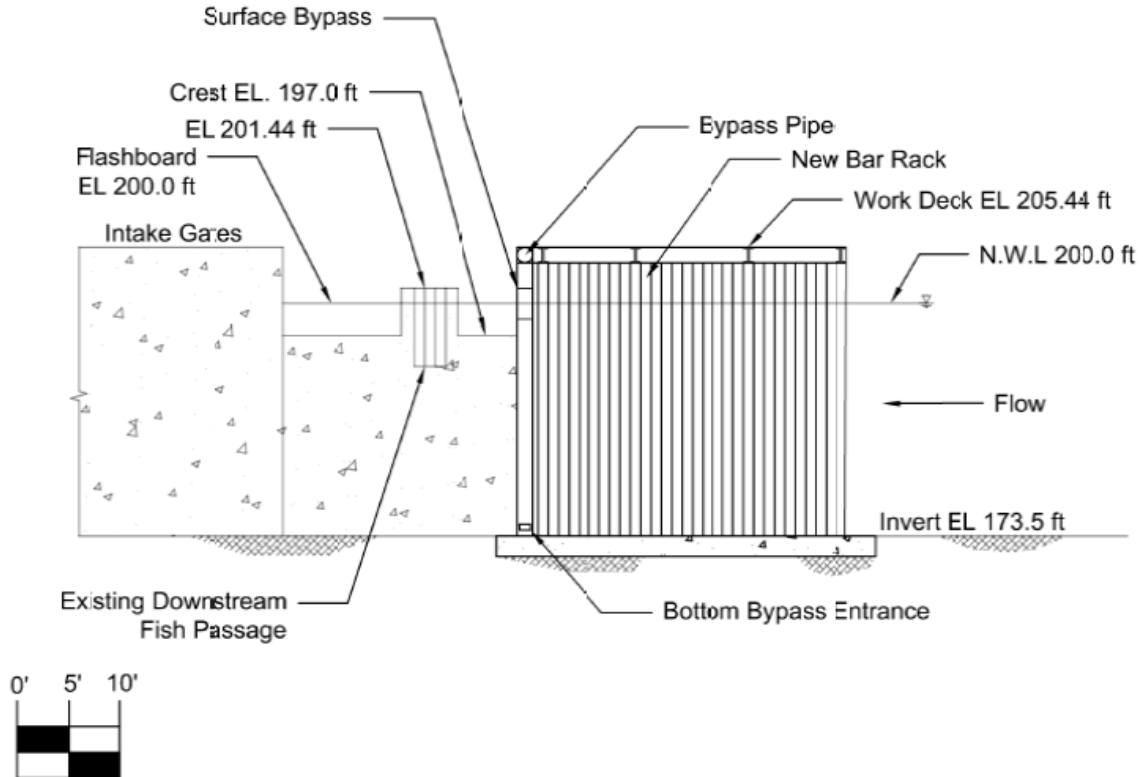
Angled bar rack designed for the Pepperell penstock intake - section view.
